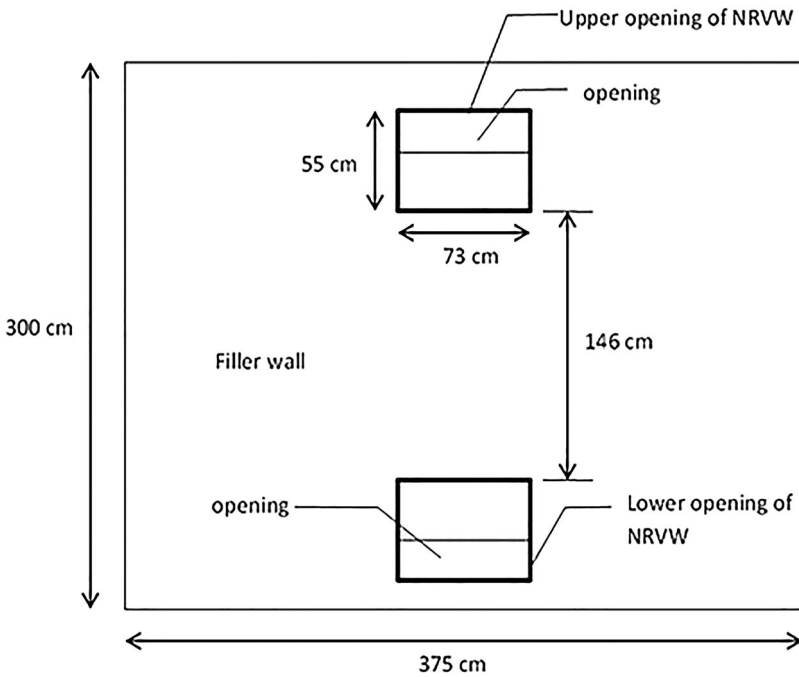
Configuration of the NRW prototype for sound insulation testing constructed at the sample-opening wall.
